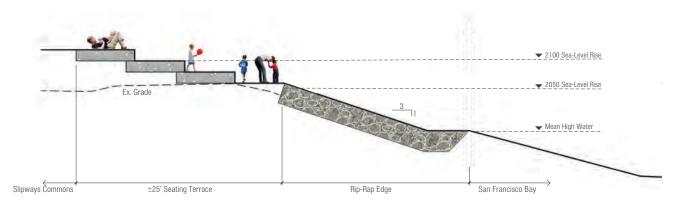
Illustrative Shoreline Section 4 Note: All dimensions and elevations are illustrative only.
